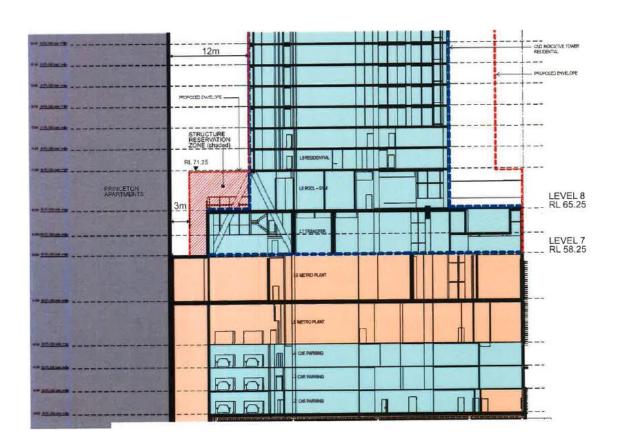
Pitt Street South Concept SSD DA – Building Section (Source: SSD 8876 Concept Stamped Plans)
